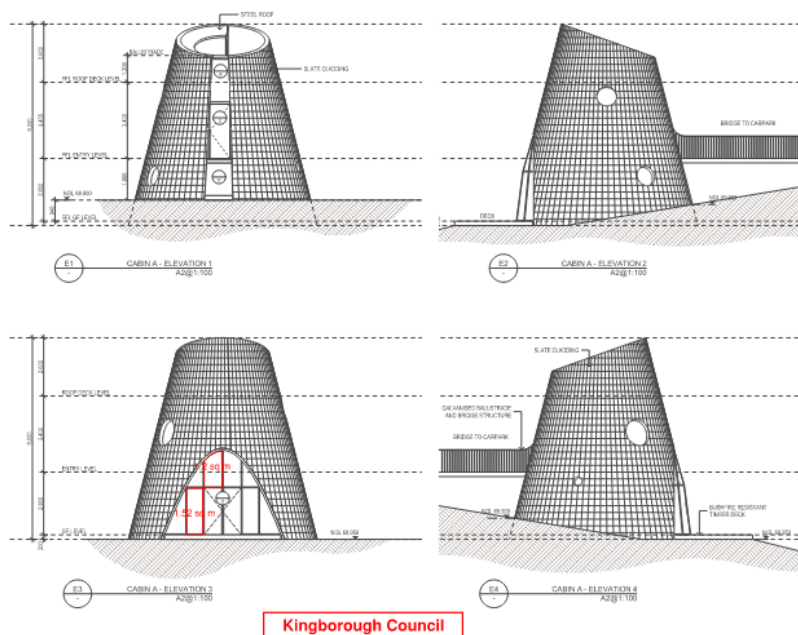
Extract of provided plans showing site plan, and elevation plans.
